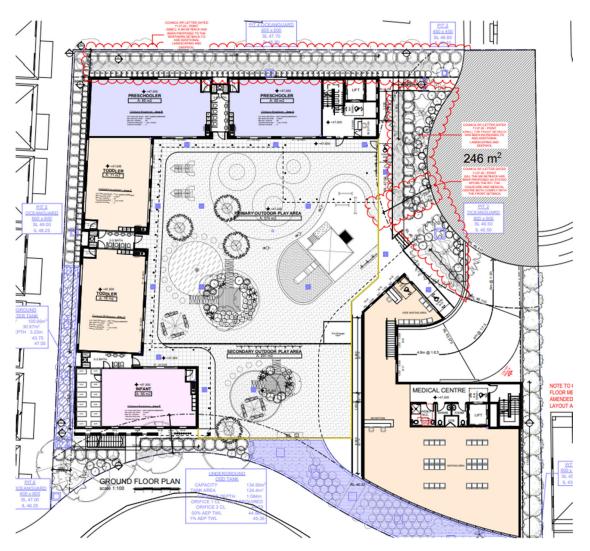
ground level floor plan with centralised outdoor childcare play space above basement
